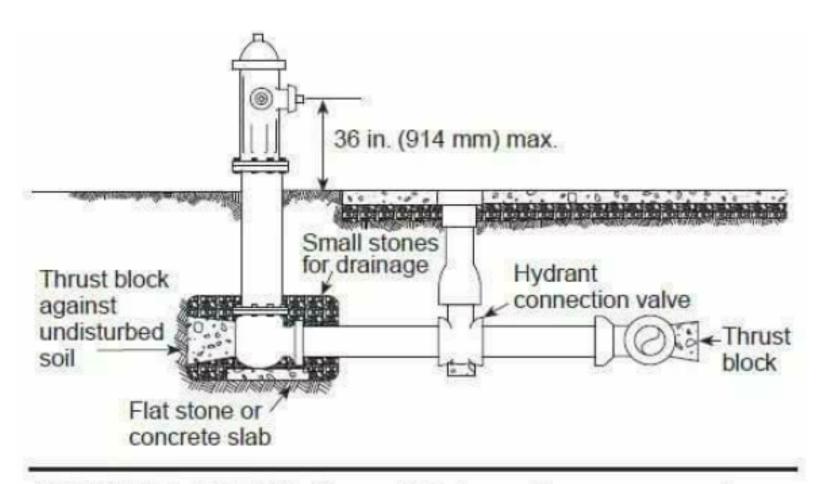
(b) Typical Hydrant Connection with Maximum Height Requirement.
